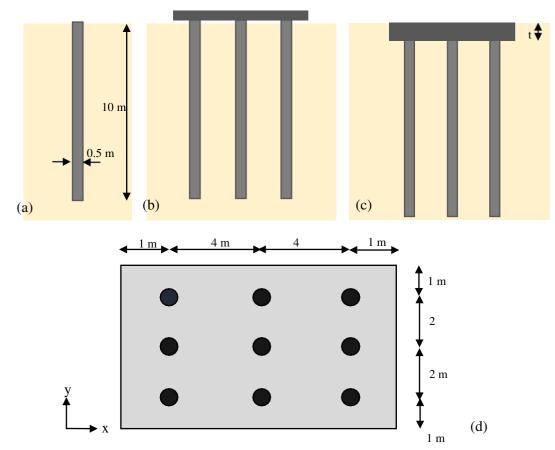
Schematic diagram showing (a) the single pile (b) pile group, (c) piled raft and (d) pile layout in PG and PR models
